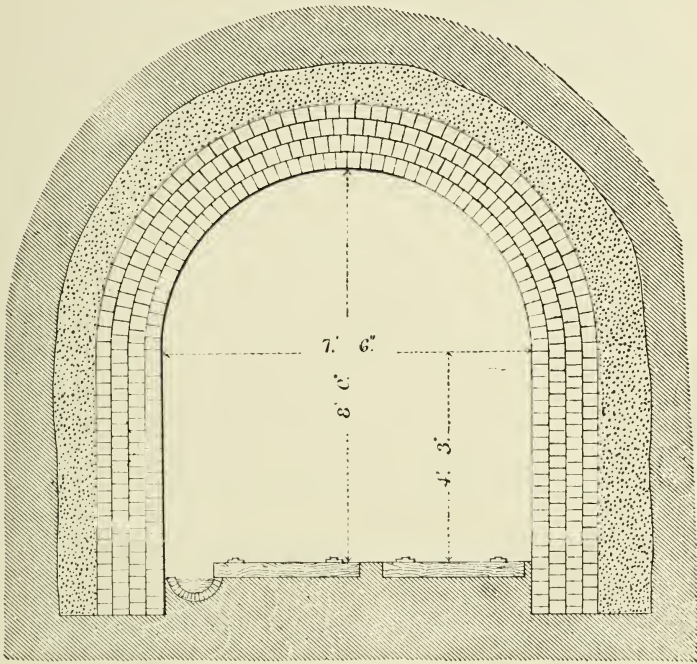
METHOD OF SECURING A ROADWAY HAVING A GOOD FLOOR BUT A BAD ROOF AND SIDES, BY MEANS OF SIDE WALLS AND SEMI-CIRCULAR ARCH.
